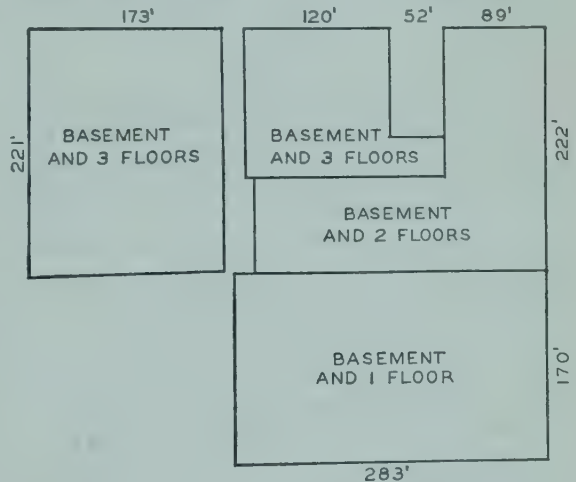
Floor Plan of Gimbel Philadelphia Store. 1937 Installation.
